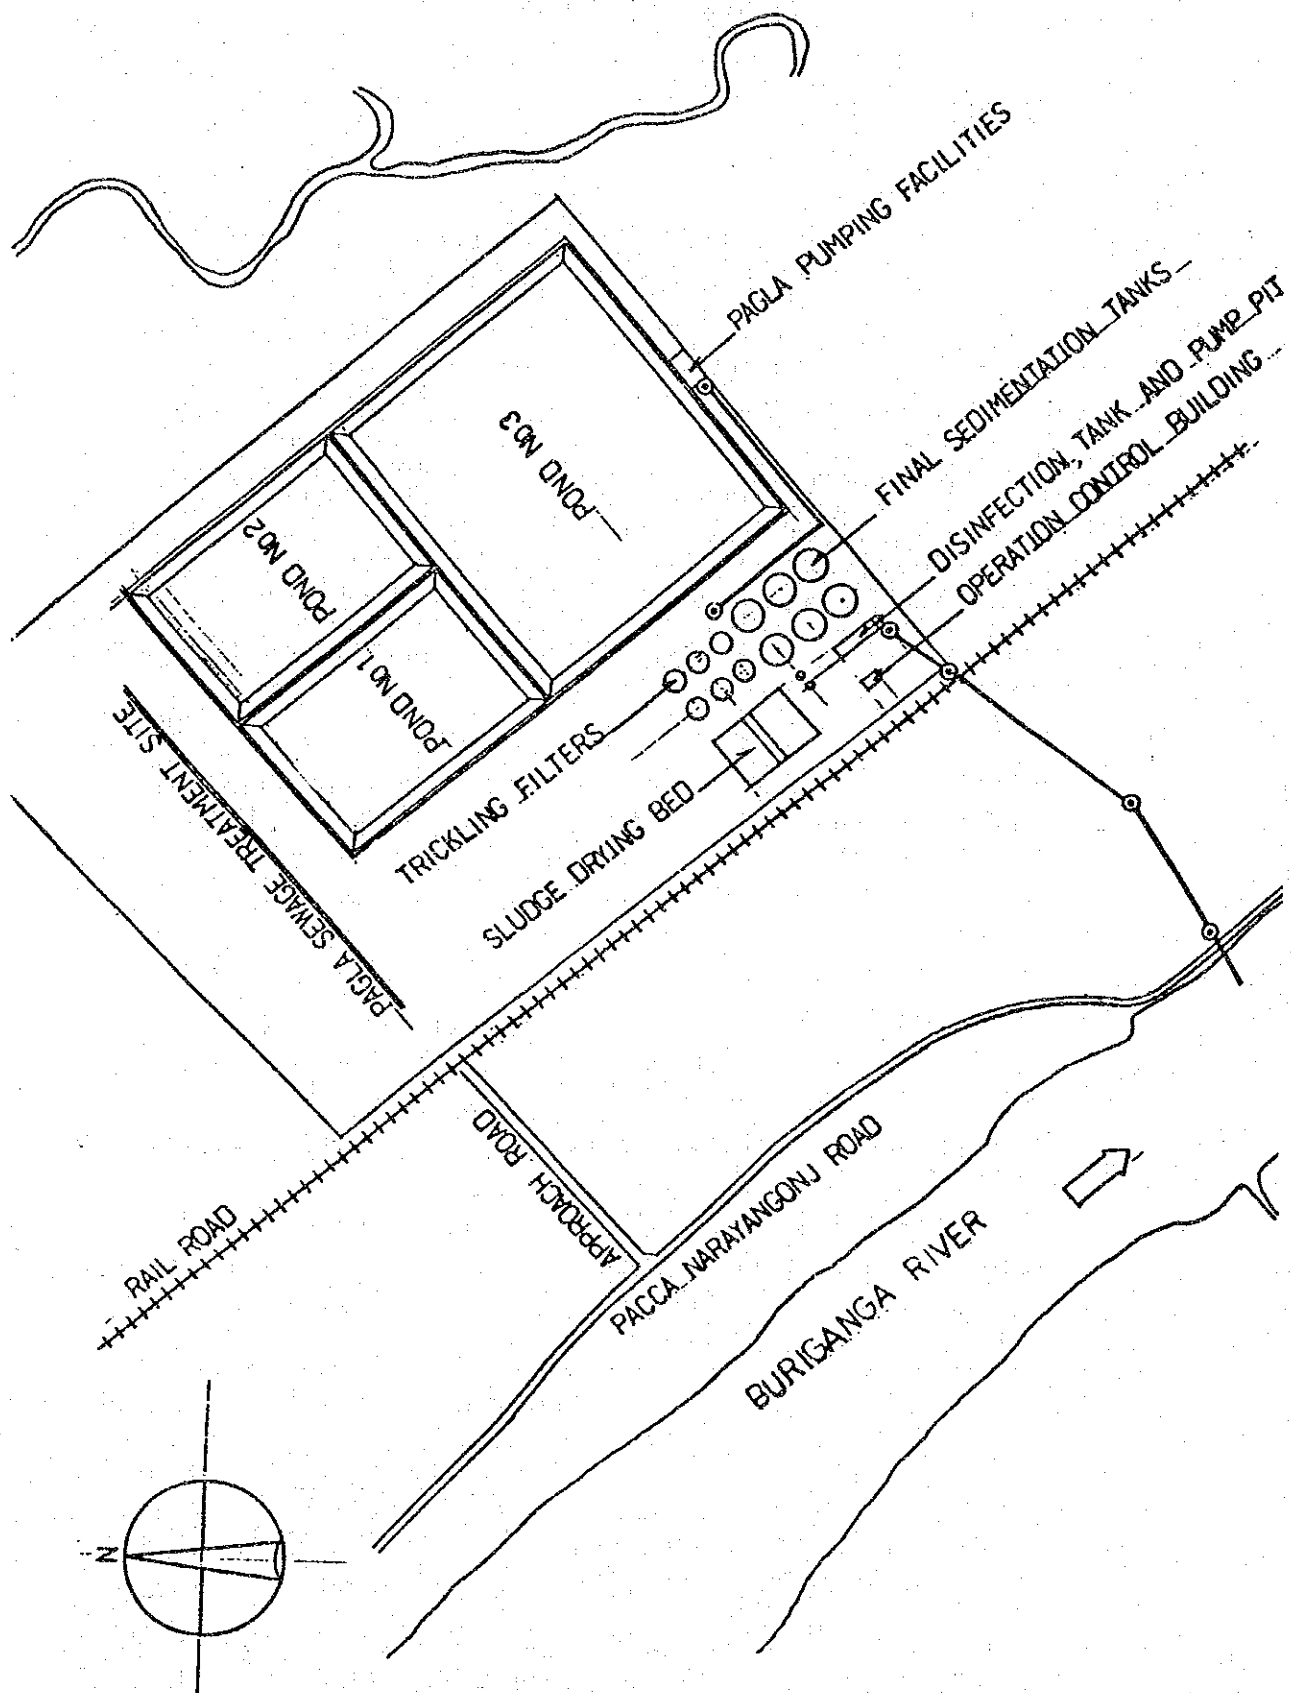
PLOT PLAN OF ADVANCED SEWAGE TREATMENT PLANT PROPOSED
